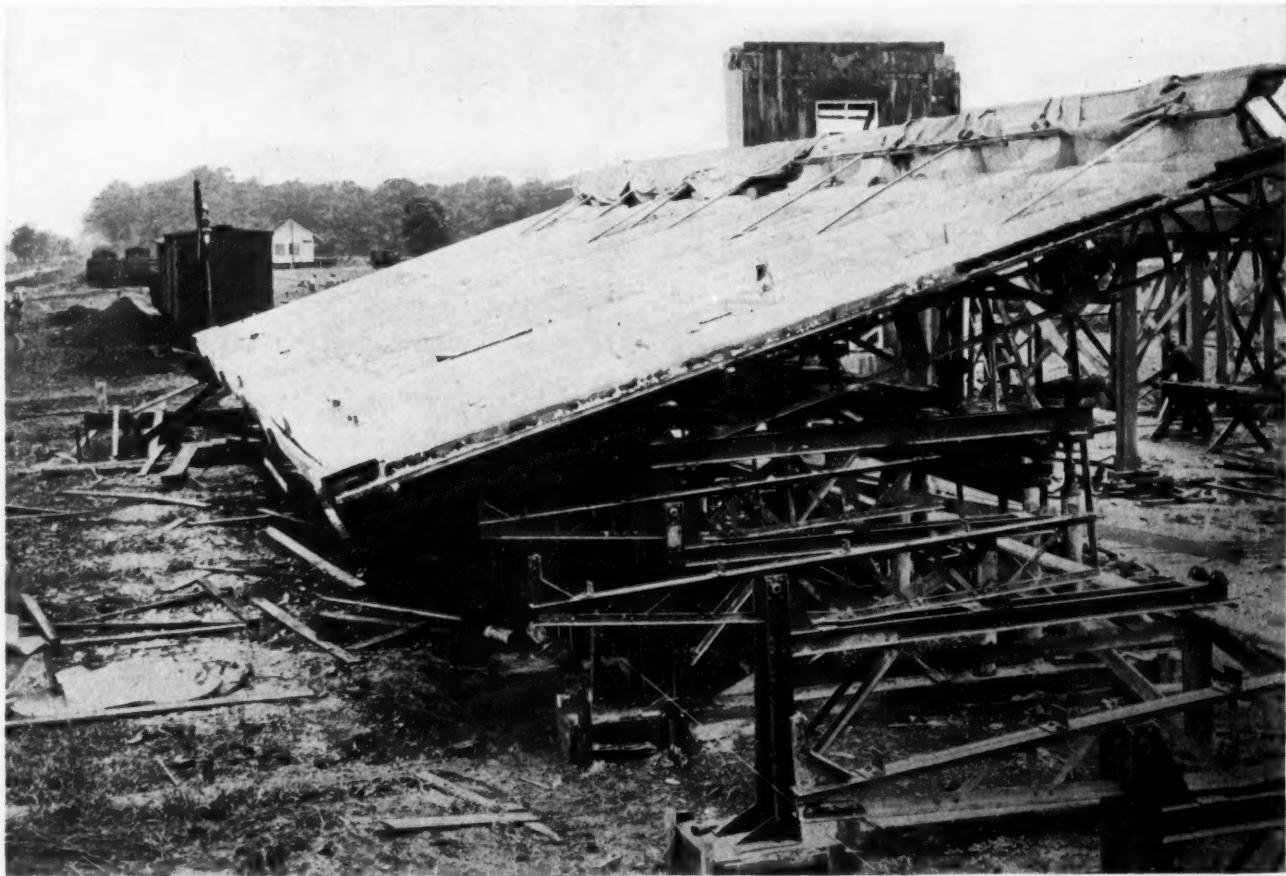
Finished Wall Section in Reclining Position, Showing Construction of Jacks
